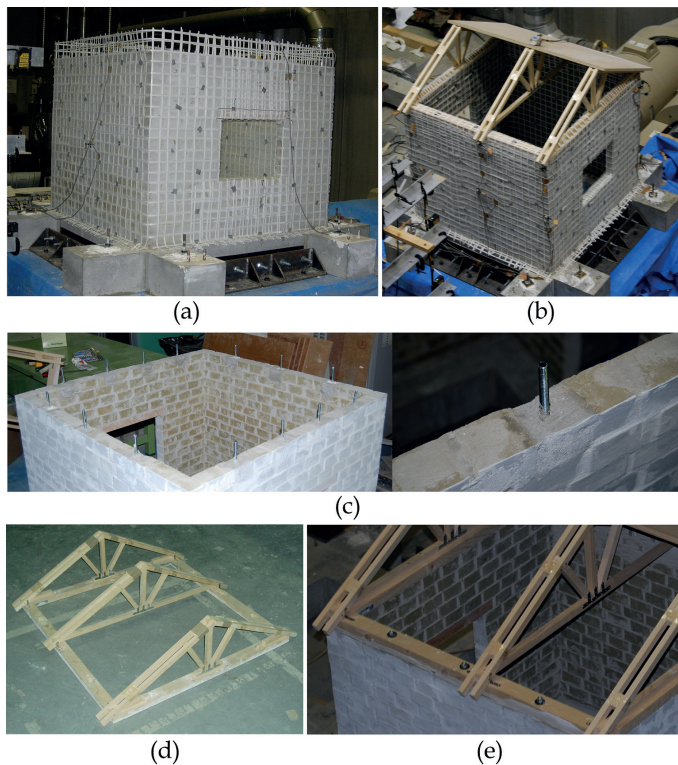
Structural components of the house model (a) top layer of the house model for roof connection (b) roof frame, and (c) house model and roof connections
